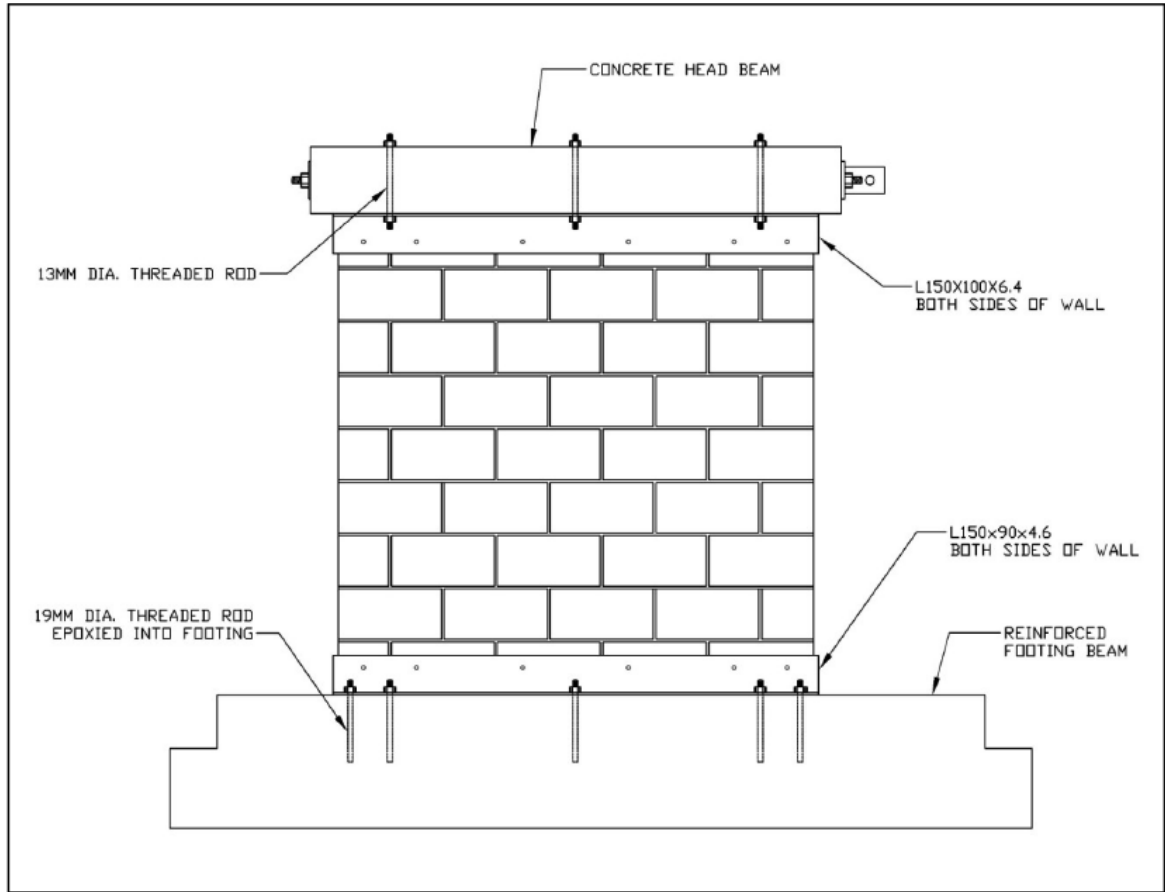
Reinforcement of Wall Into Header and Footer Beams (Ing, 2010)
